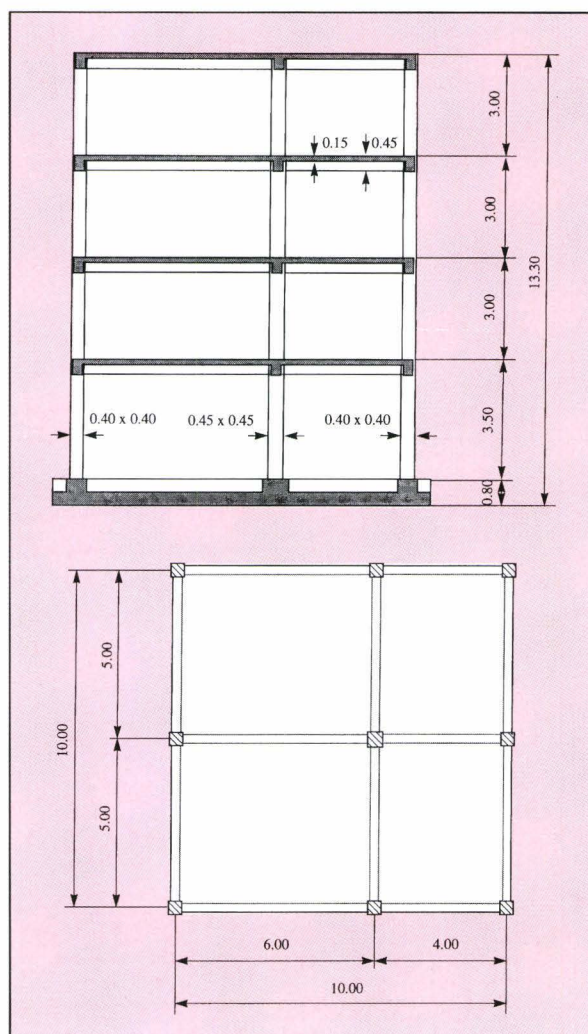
Layout of 4-storey reinforced concrete framed structure
